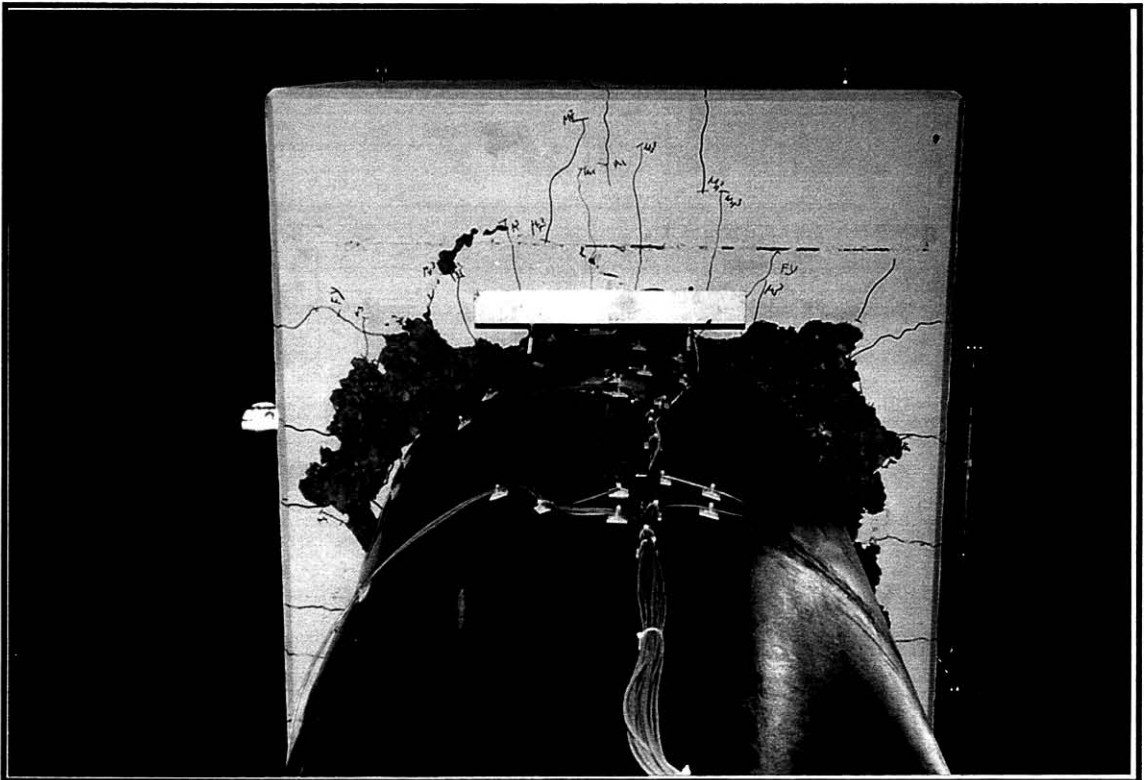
Cap Beam Cracking on the Bottom Surface
